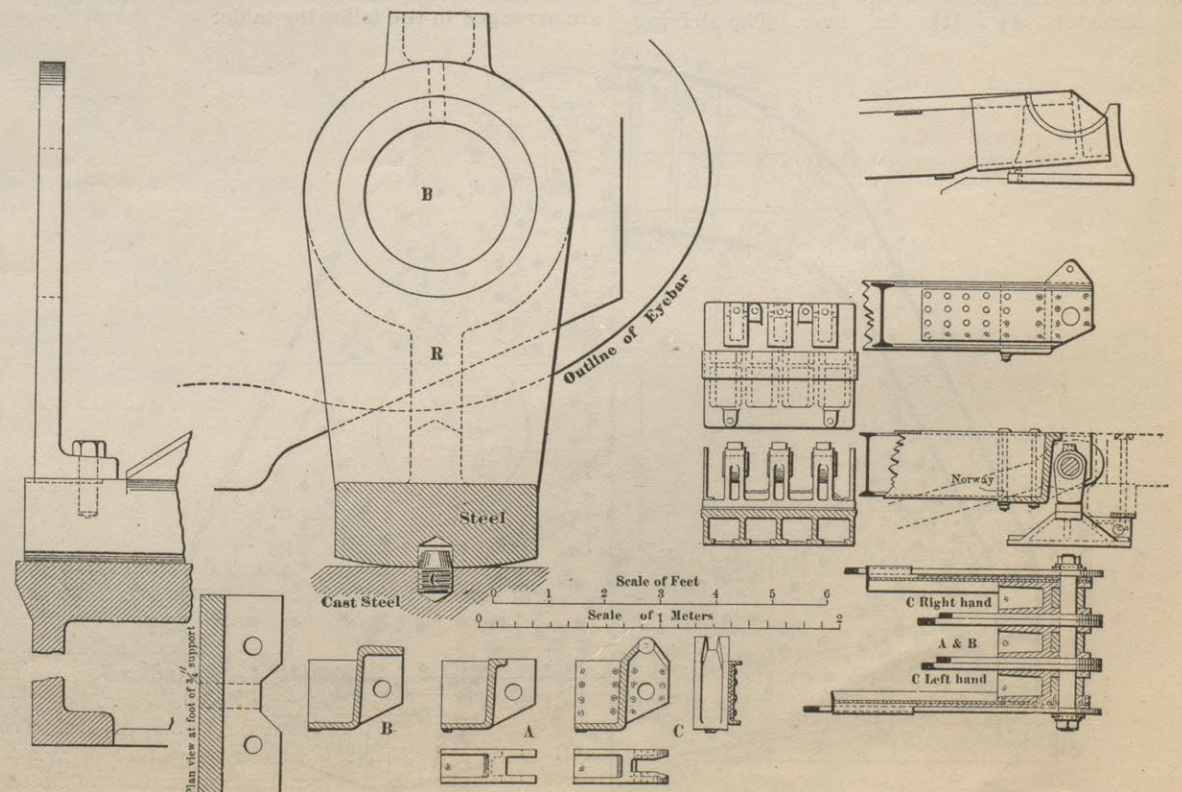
DETAILS OF END PIN AND ROCKER.
